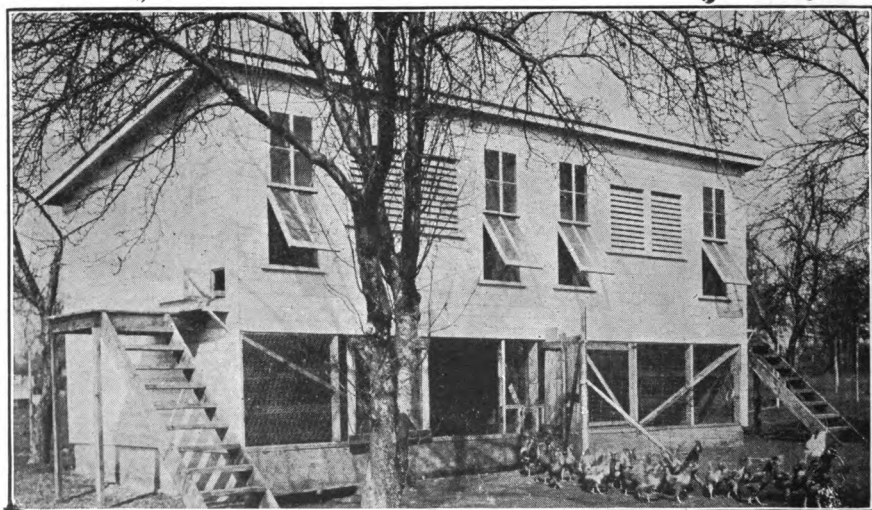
Two story Fool Proof House. The shutter ventilators should be lowered to within a foot of the floor. That is the only improvement we could suggest in the above plan to make it highly satisfactory in every detail.
